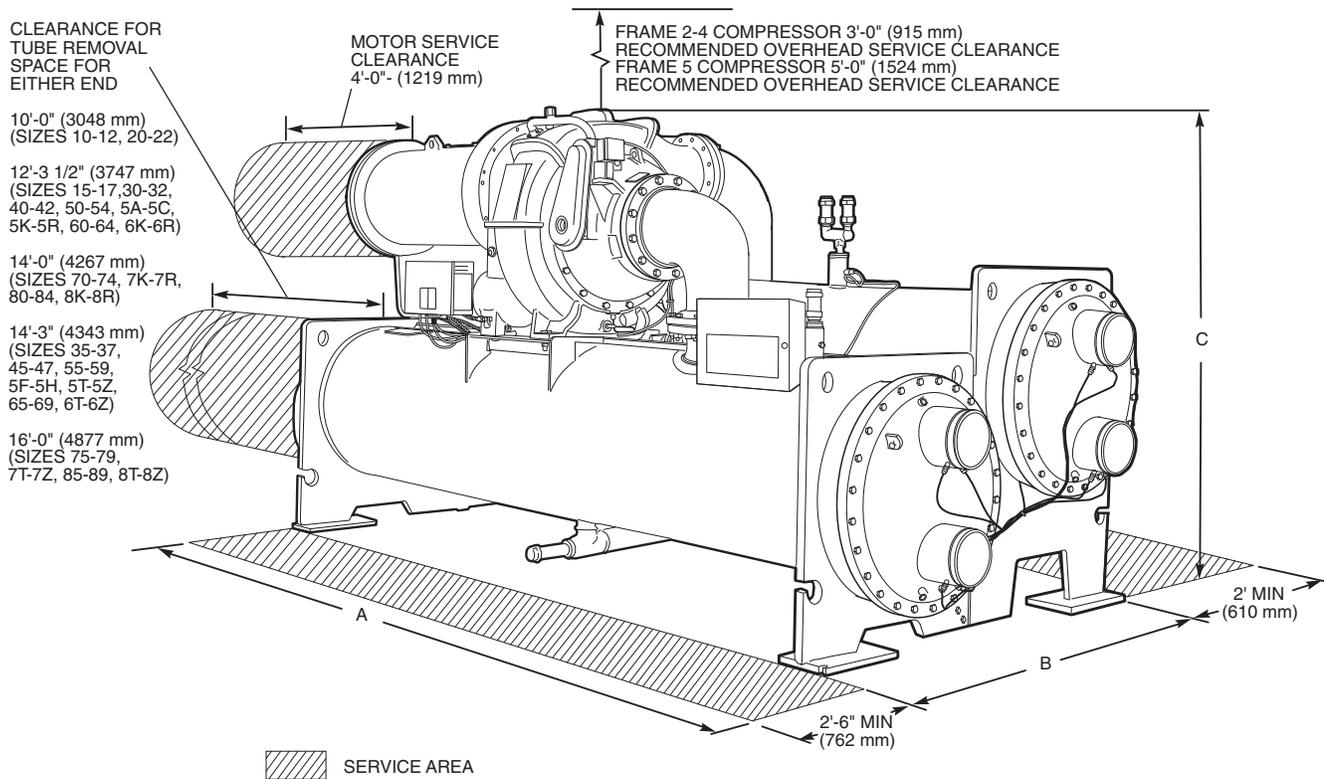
19XR Dimensions (Refer to Tables 1 Through 3)
